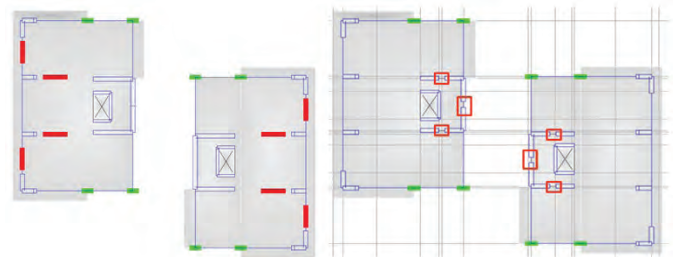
Energy dissipation alternatives. - Viscous walls in partitions (in red) and viscous walls coupling concrete walls (in red boxes)
